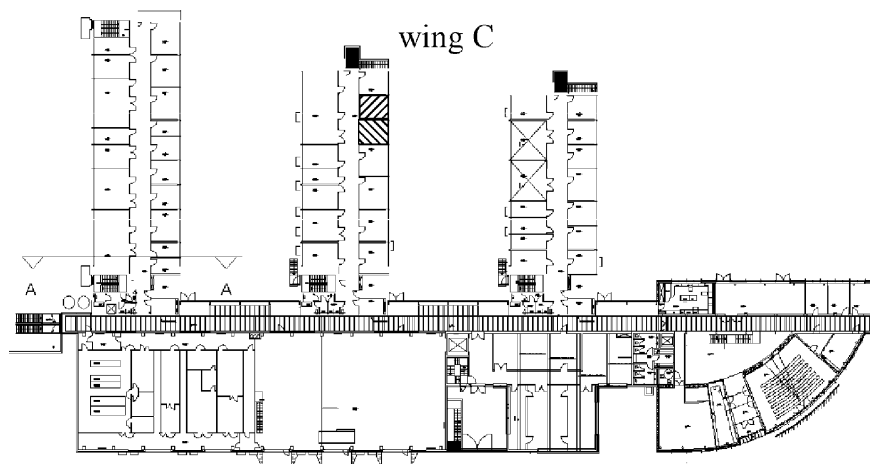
Floor plan. All office rooms in the building wing C are facing South and the laboratories North. The two office rooms (experiments) are on the ground floor.
